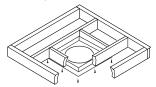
Firestop Spacer with Living Space Above Ceiling
